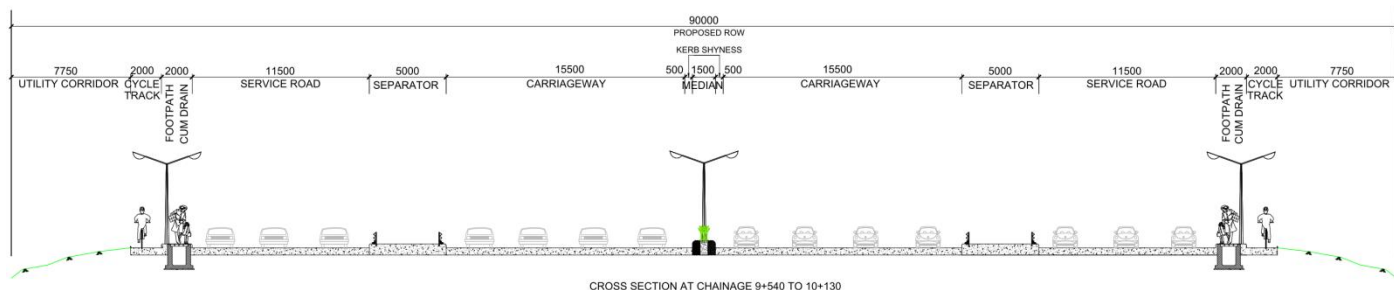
Typical at Grade Cross Section (TCS-5) between Km 9.540 and Km 10.2
